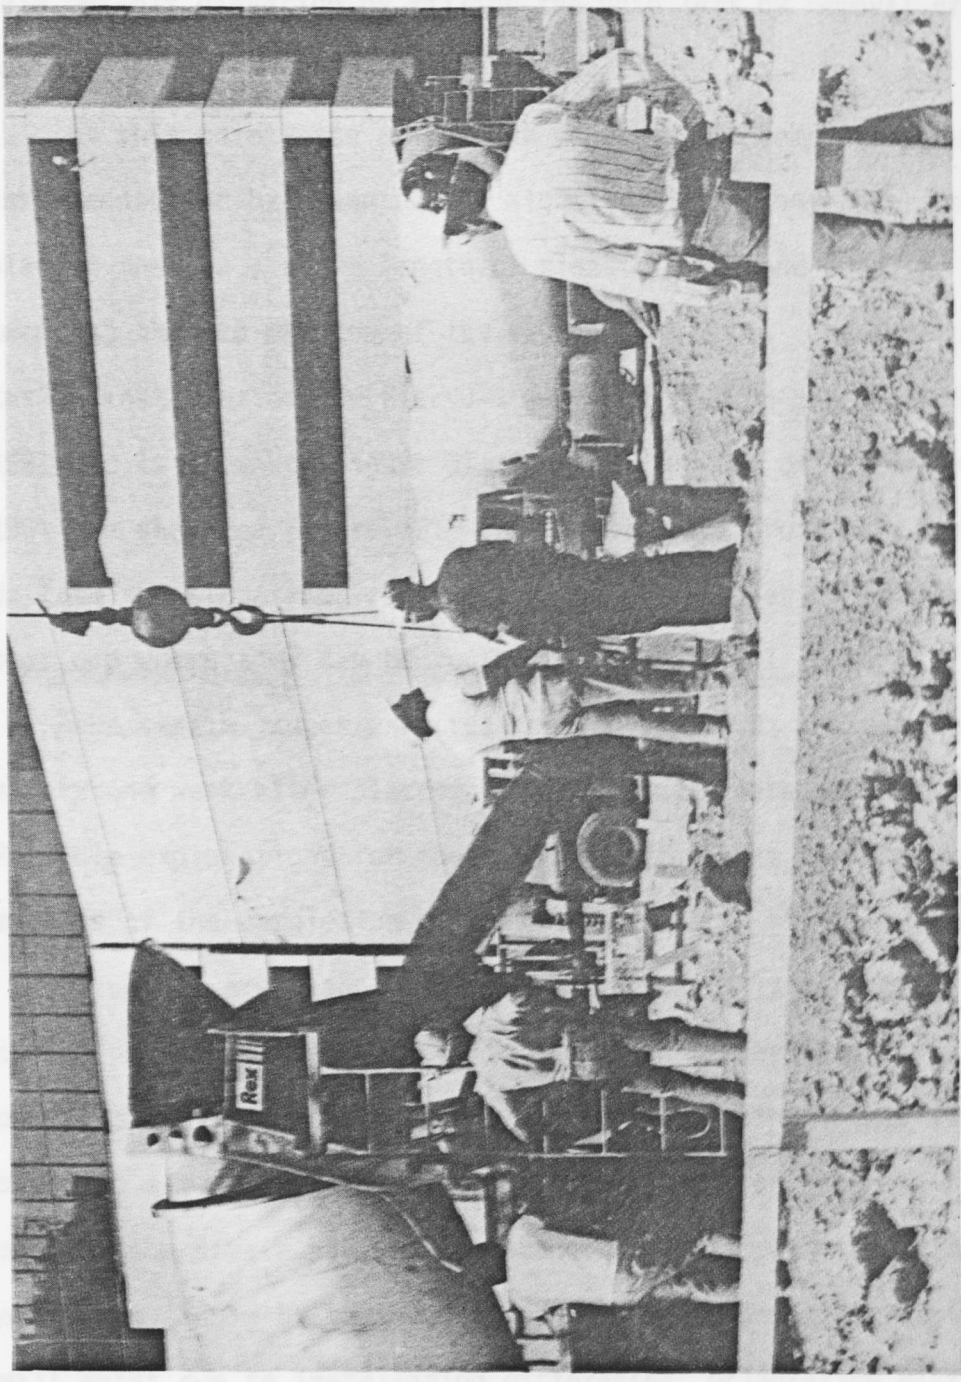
CONCRETE PLACEMENT IN PIER SHAFT
